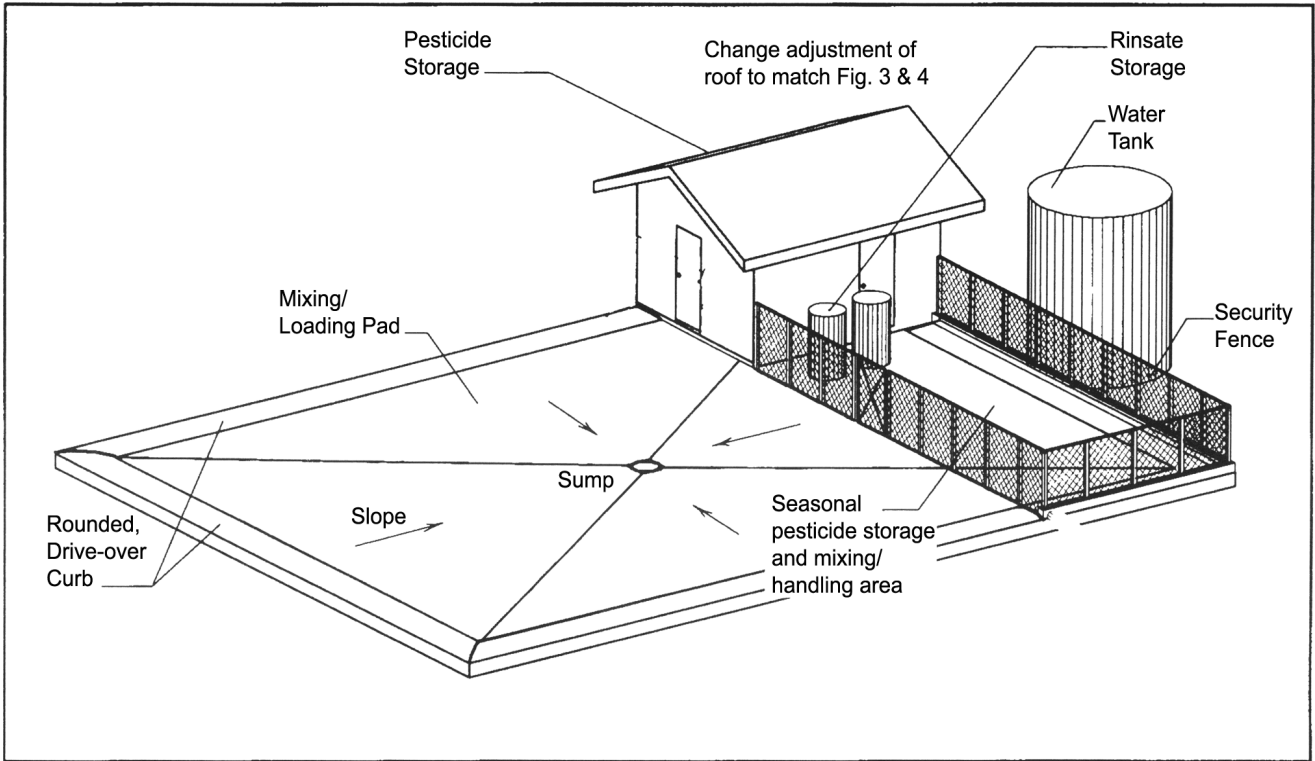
Single sump mix/load pad with pesticide storage. See figs. 4 & 5 for plan view and cross section.
